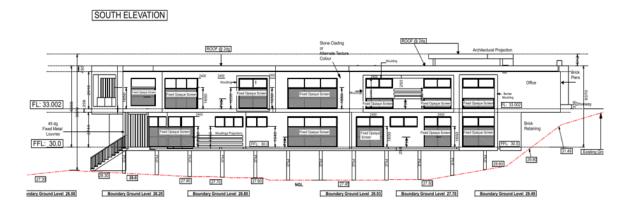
Elevation from south side of subject dwelling as viewed from southern adjoining lots
